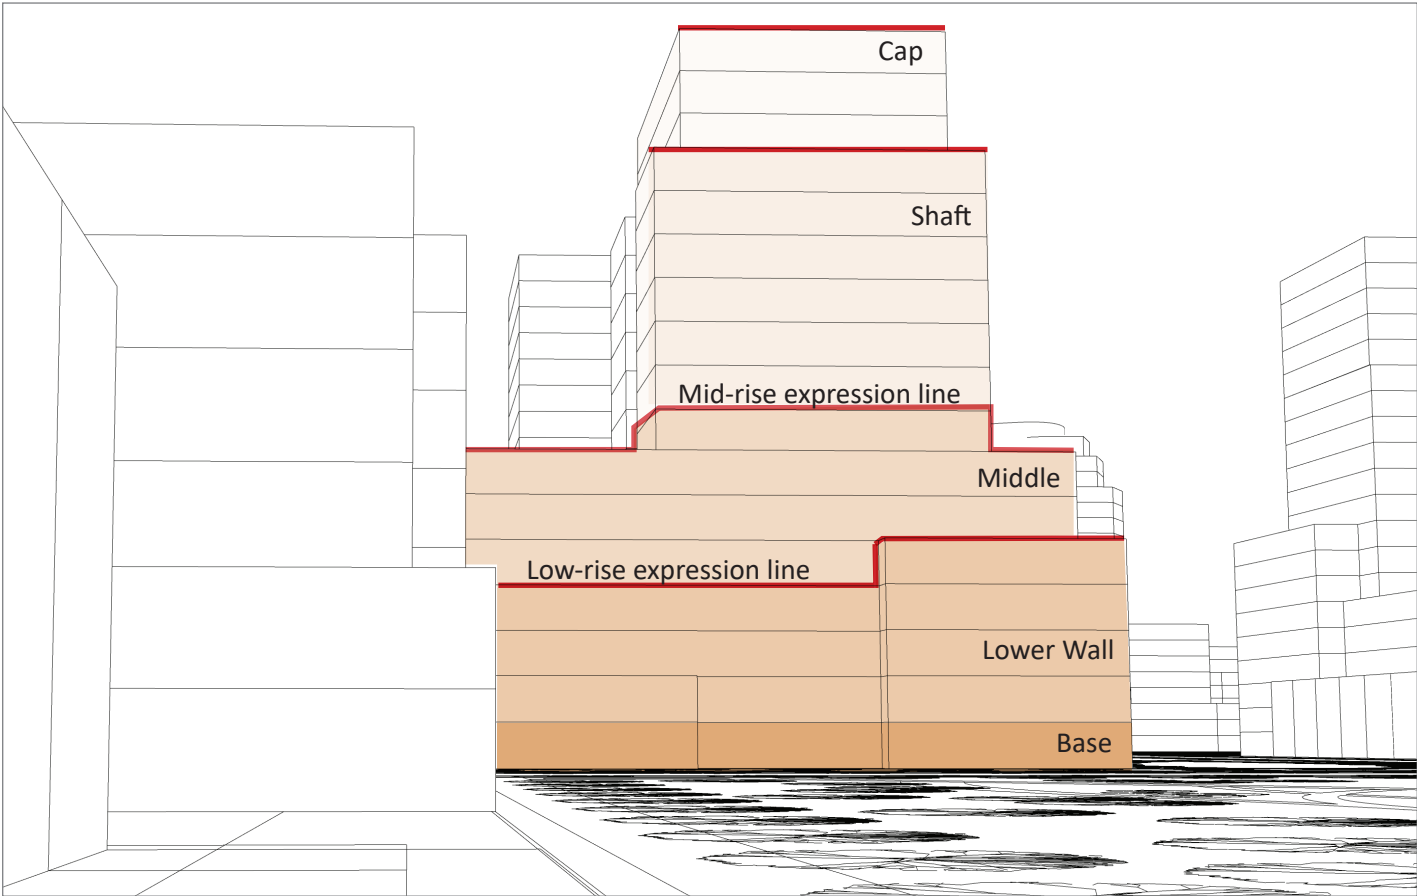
Taller buildings have been embedded in blocks with stepped down built form that includes lower-scale transitional massing, such as podiums or projecting mid-rise and low-rise forms, and punctuated roofscape profiles to avoid overbearing massing.
